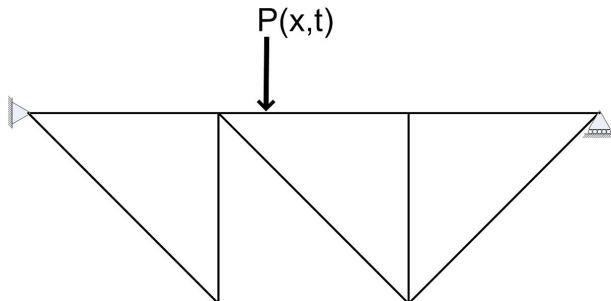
Example of a plane truss system with loading function  $P(x,t)$
